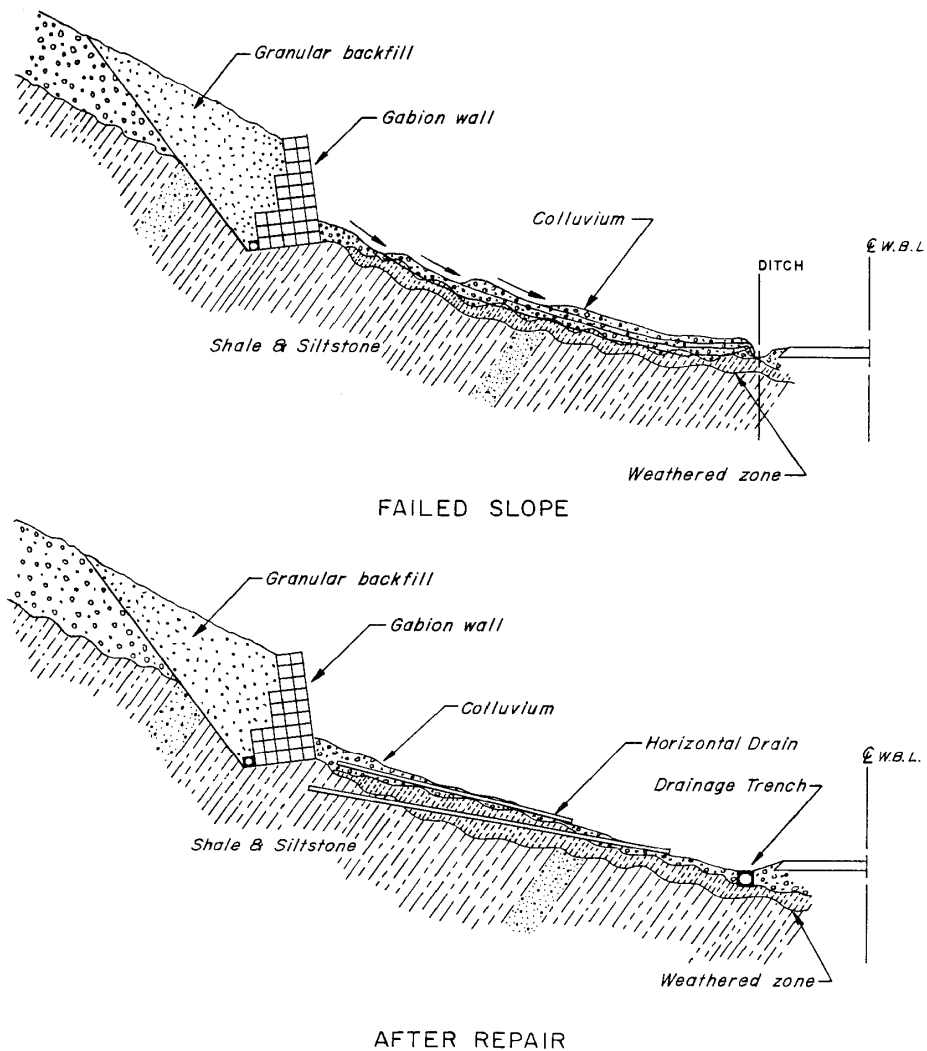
Schematic views of slide 4-W at Rockwood before and after repair. (Royster, 1977)
